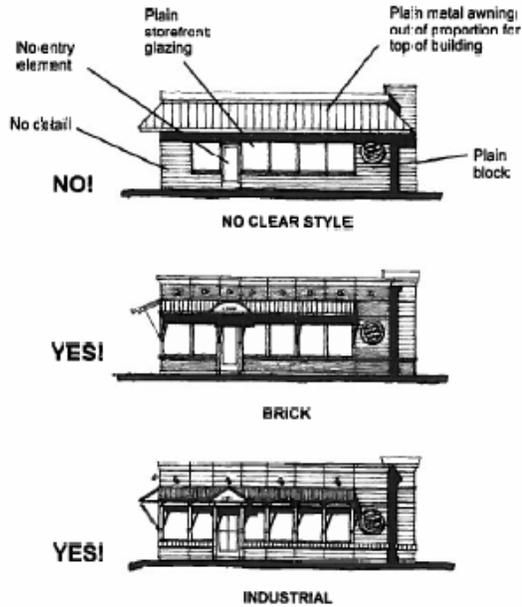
A consistent architectural style or theme should be used throughout a Commercial Center and, in particular, to tie outlying pad site buildings to the primary building.
